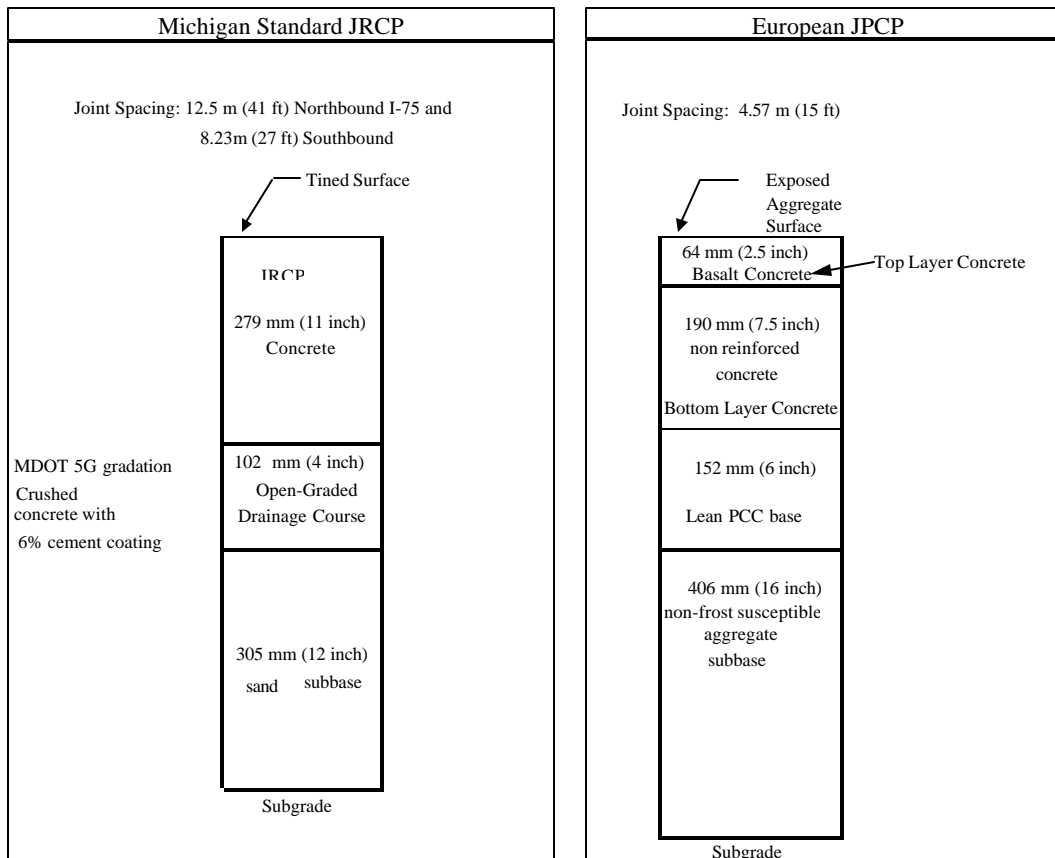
Pavement cross section for the European and the Michigan pavements on I-75, Detroit, Michigan.
